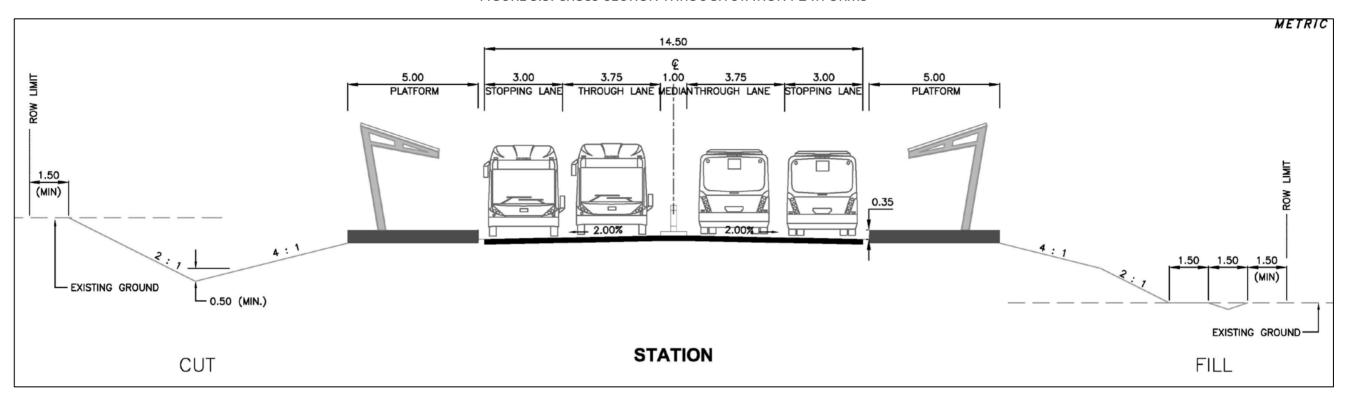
CROSS-SECTION AT STATION APPROACH
